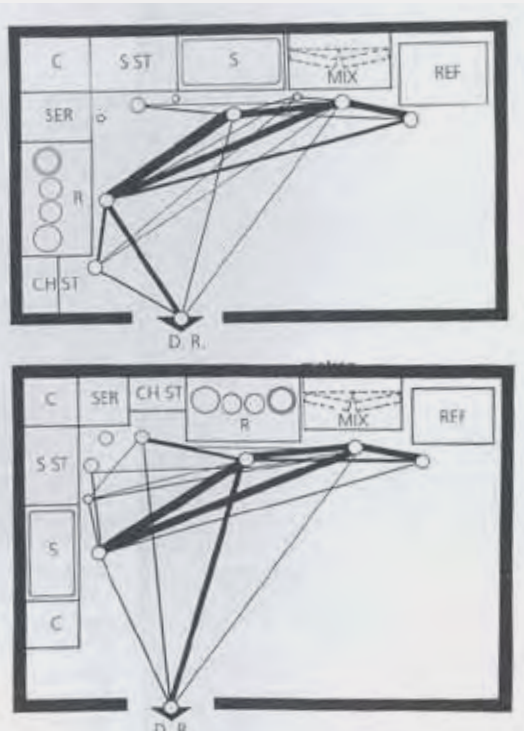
Travel lines are shown here in two different kitchen layouts. Walking through the lower plan requires the user to walk 29 yards more than the top plan.
